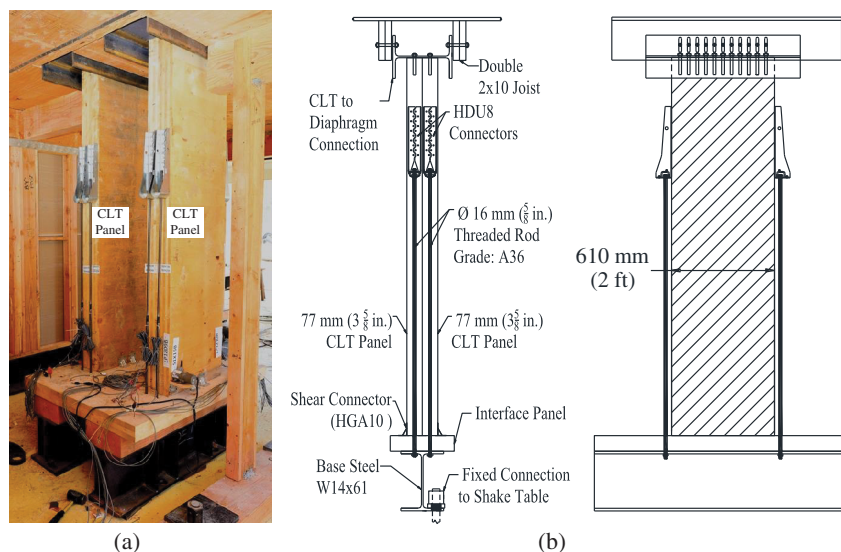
CLT panels: (a) CLT installed in first story; (b) elevation views and design details
